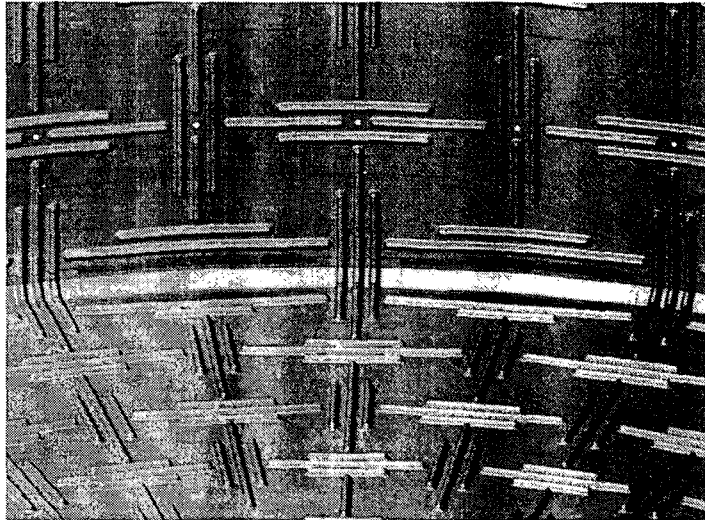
Assembly drawing of wall, corner & bottom Membrane.
